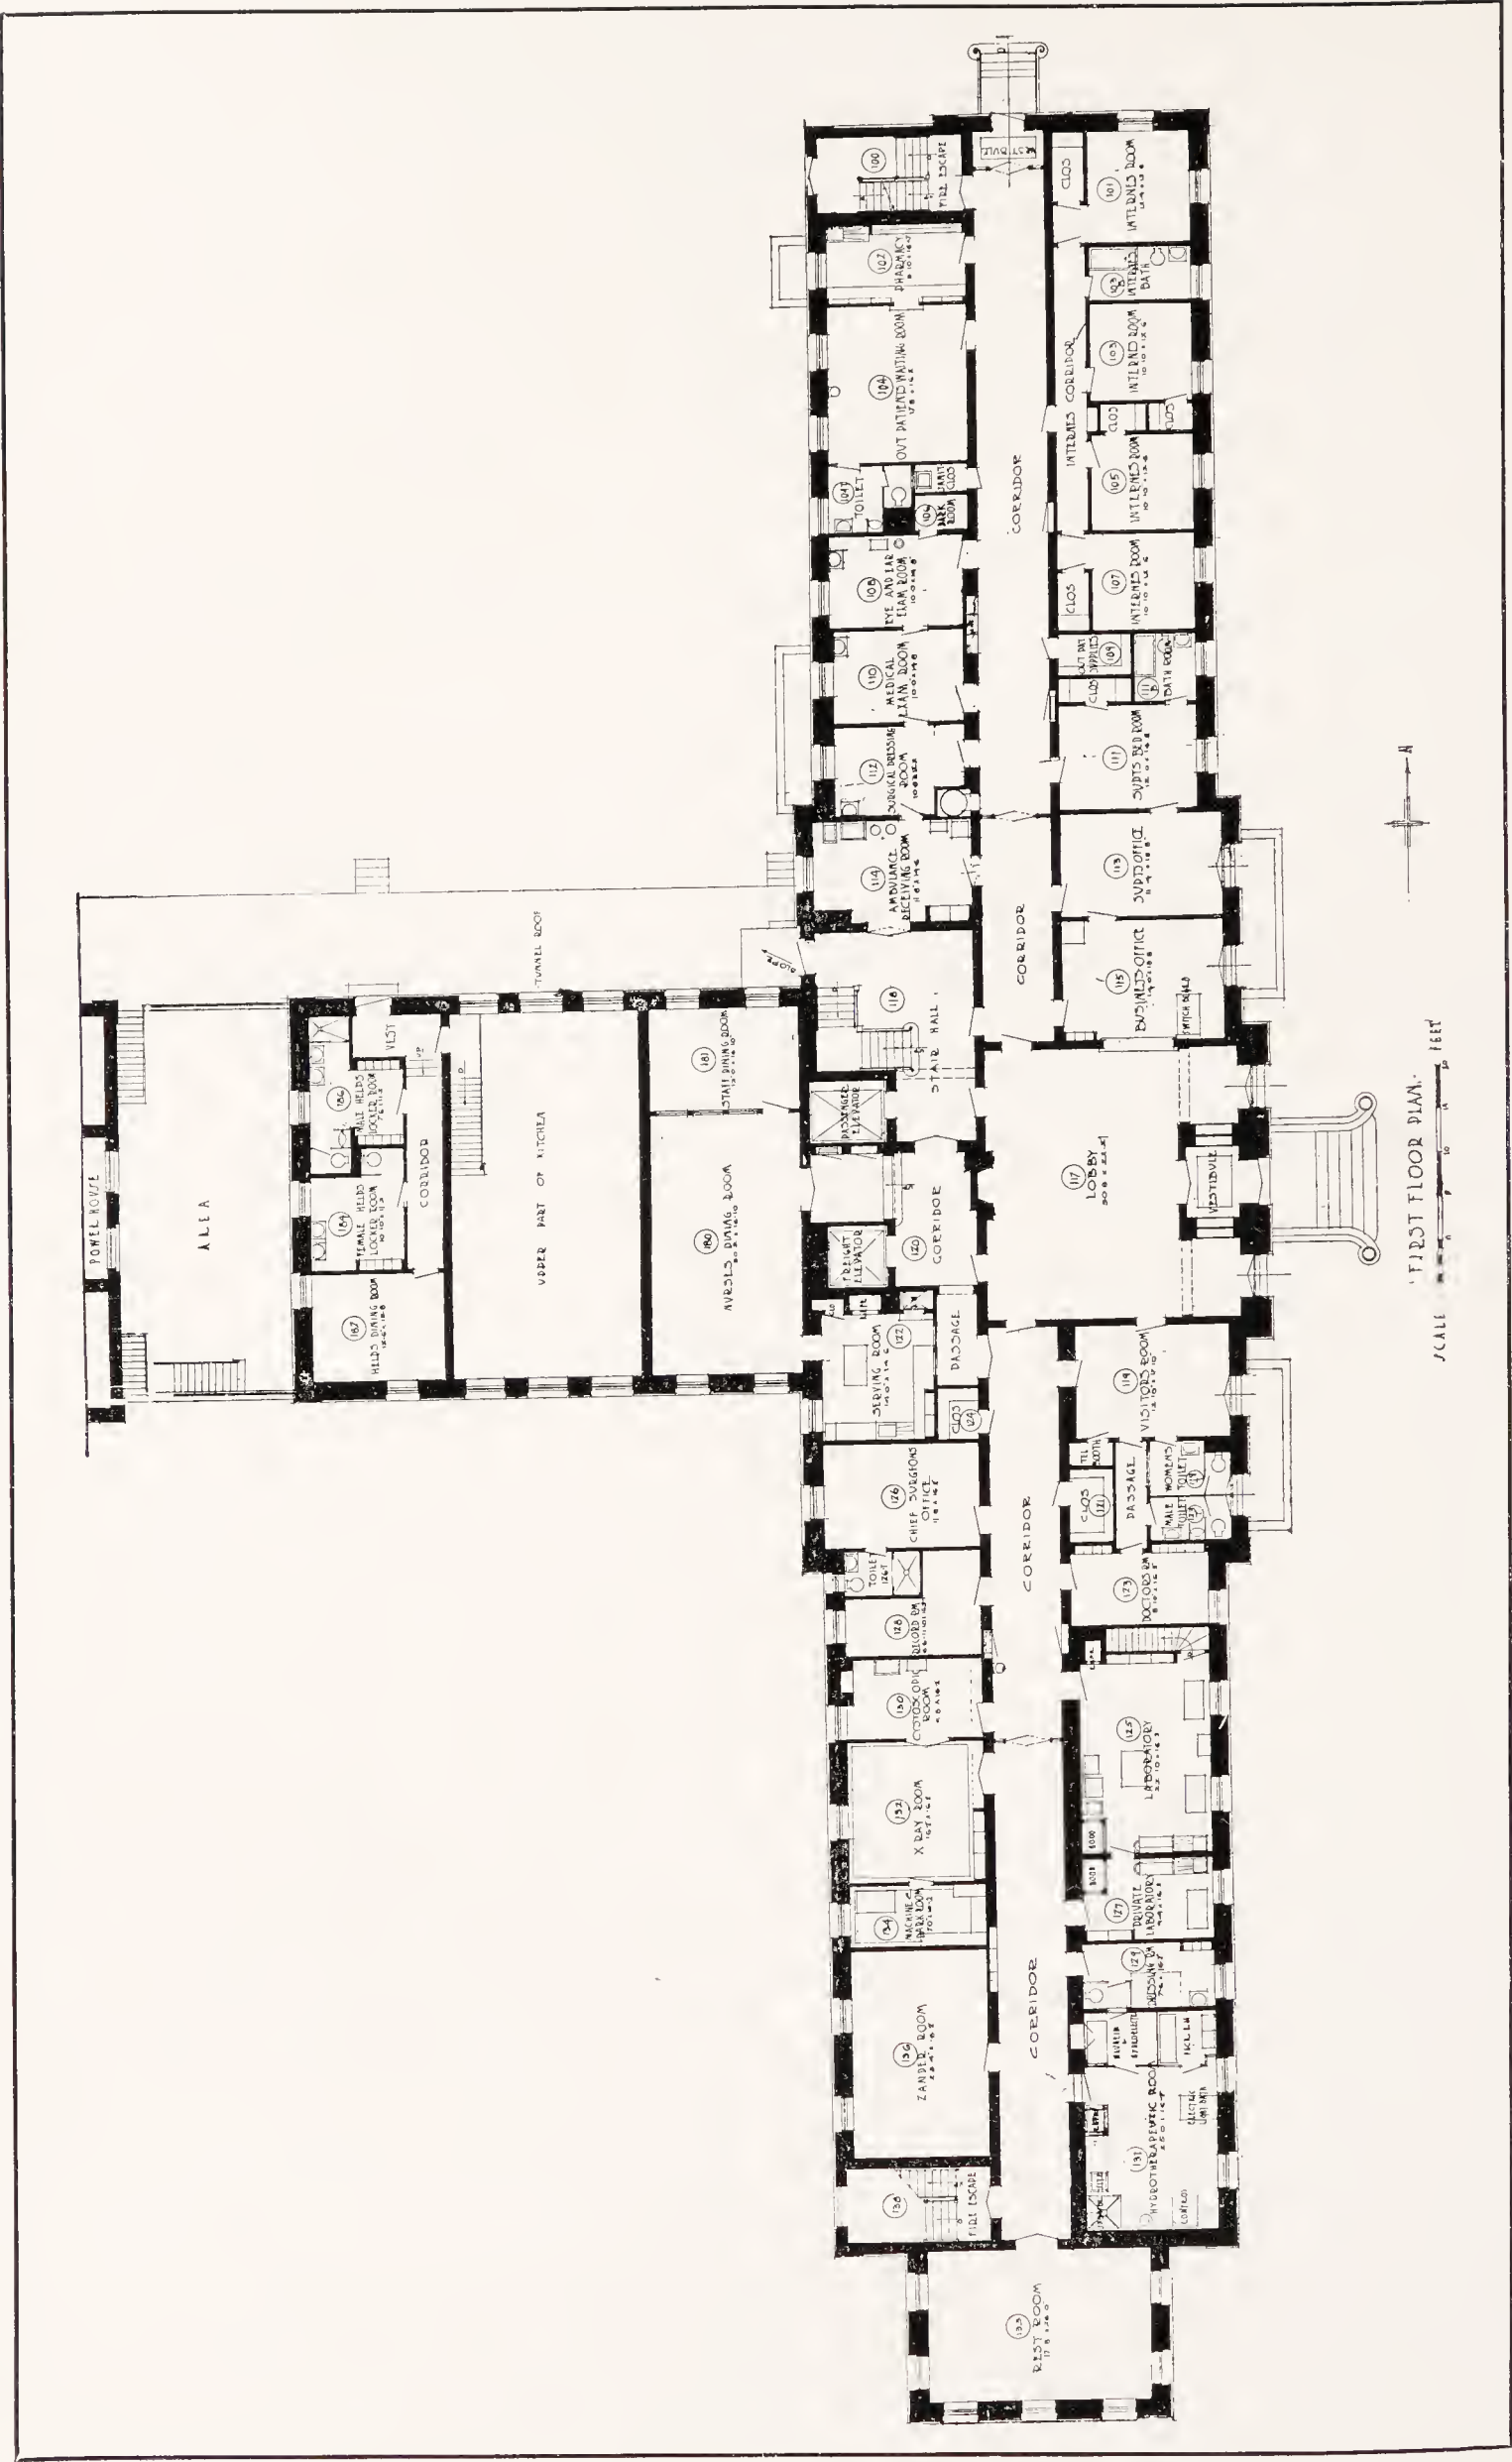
FIRST FLOOR PLAN, ILLINOIS CENTRAL RAILROAD HOSPITAL, CHICAGO, ILL.
